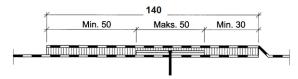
Positions of mechanical fasteners in 140 mm welded overlap joints.
